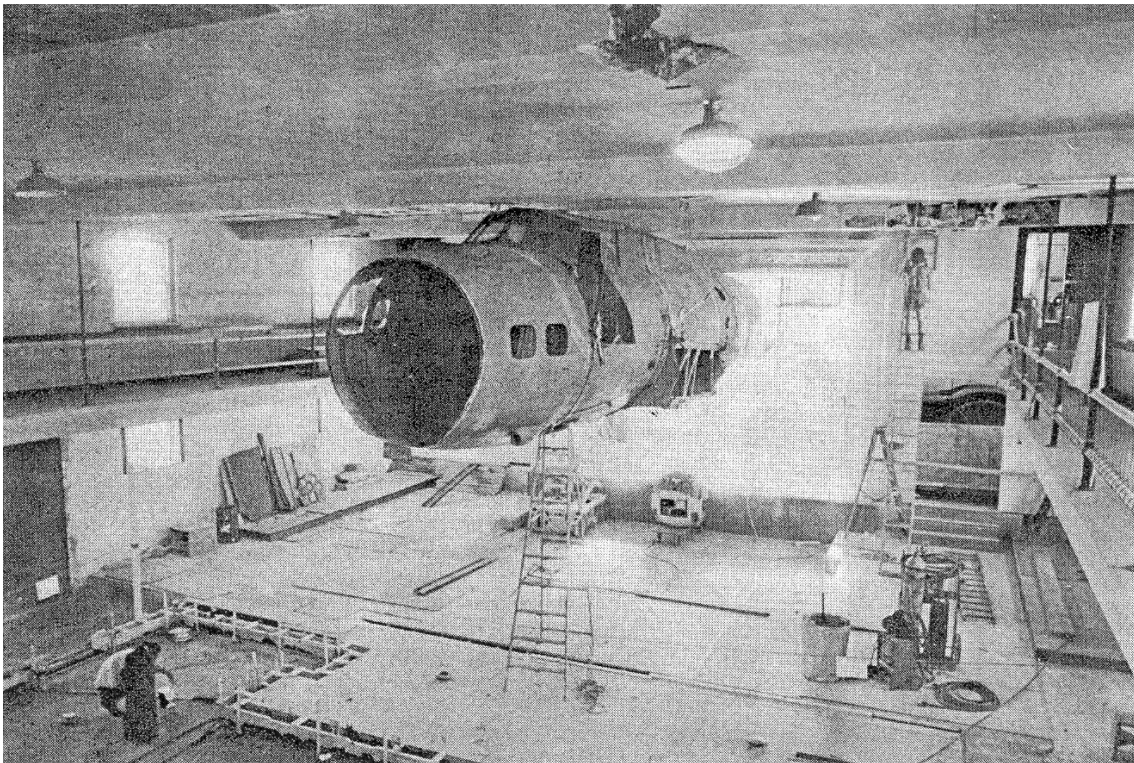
showing installation of B-17 plane suspended from truss G line
